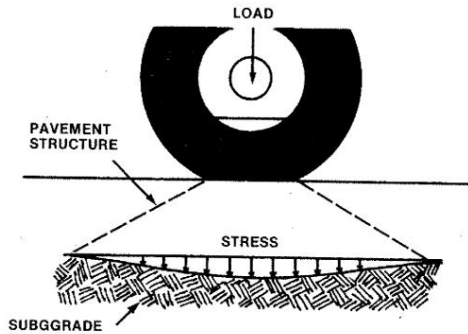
Typical structure of a road pavement (TRL, 1993).
